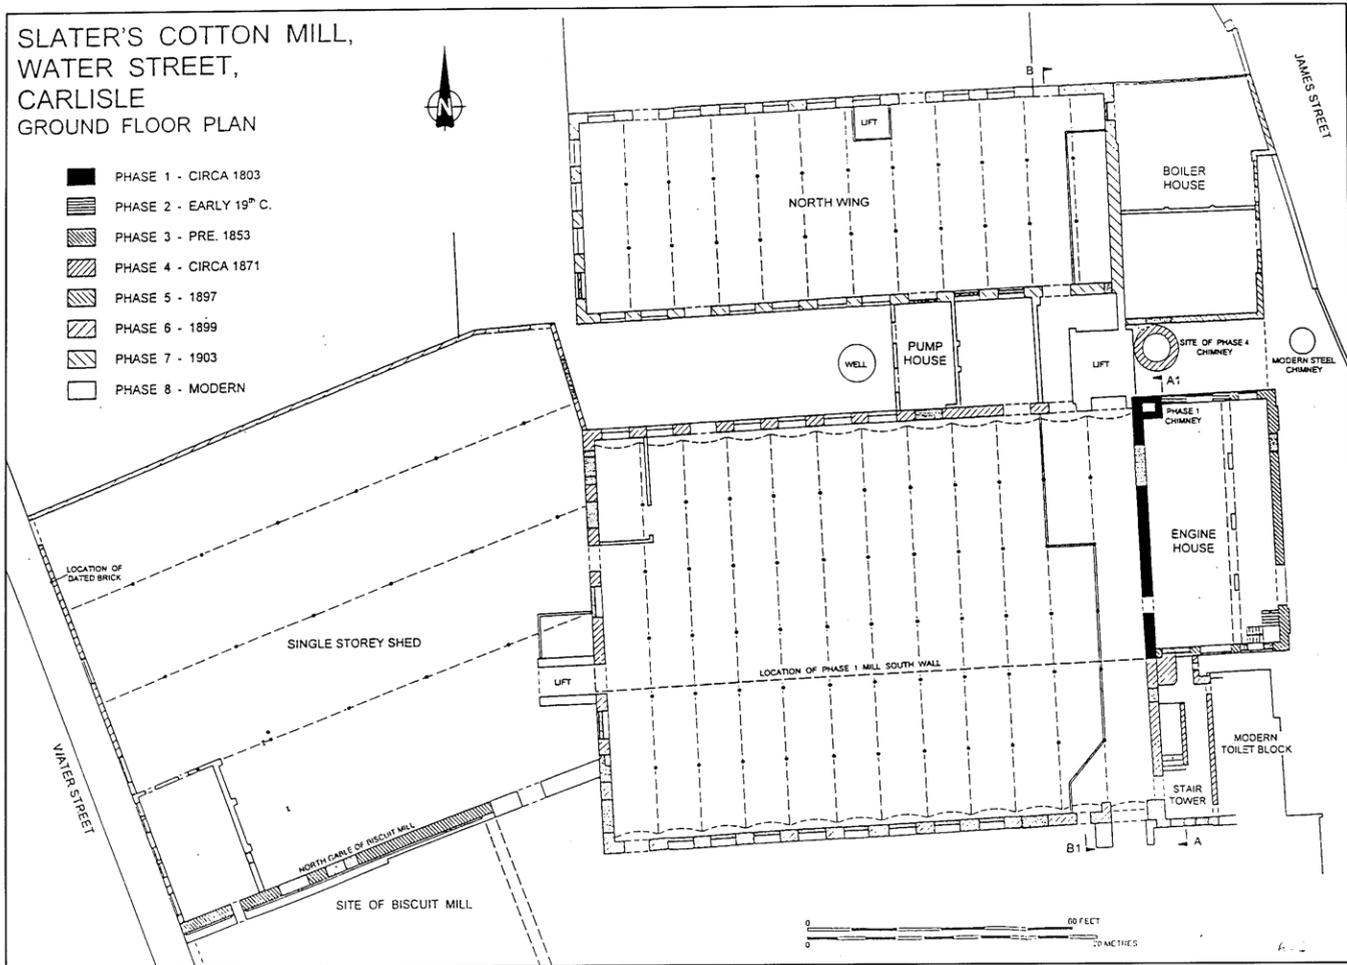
Slaters Cotton Mill, Water Street, Carlisle: Ground Floor Plan.
